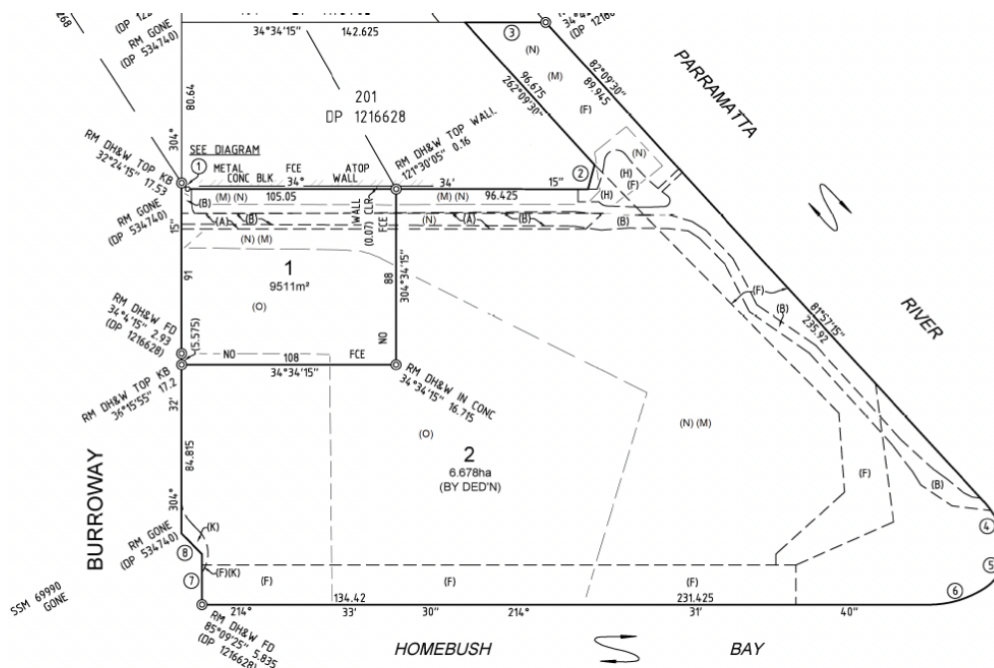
Approved Site and Location Plan DA/644/2017 (CM+)
